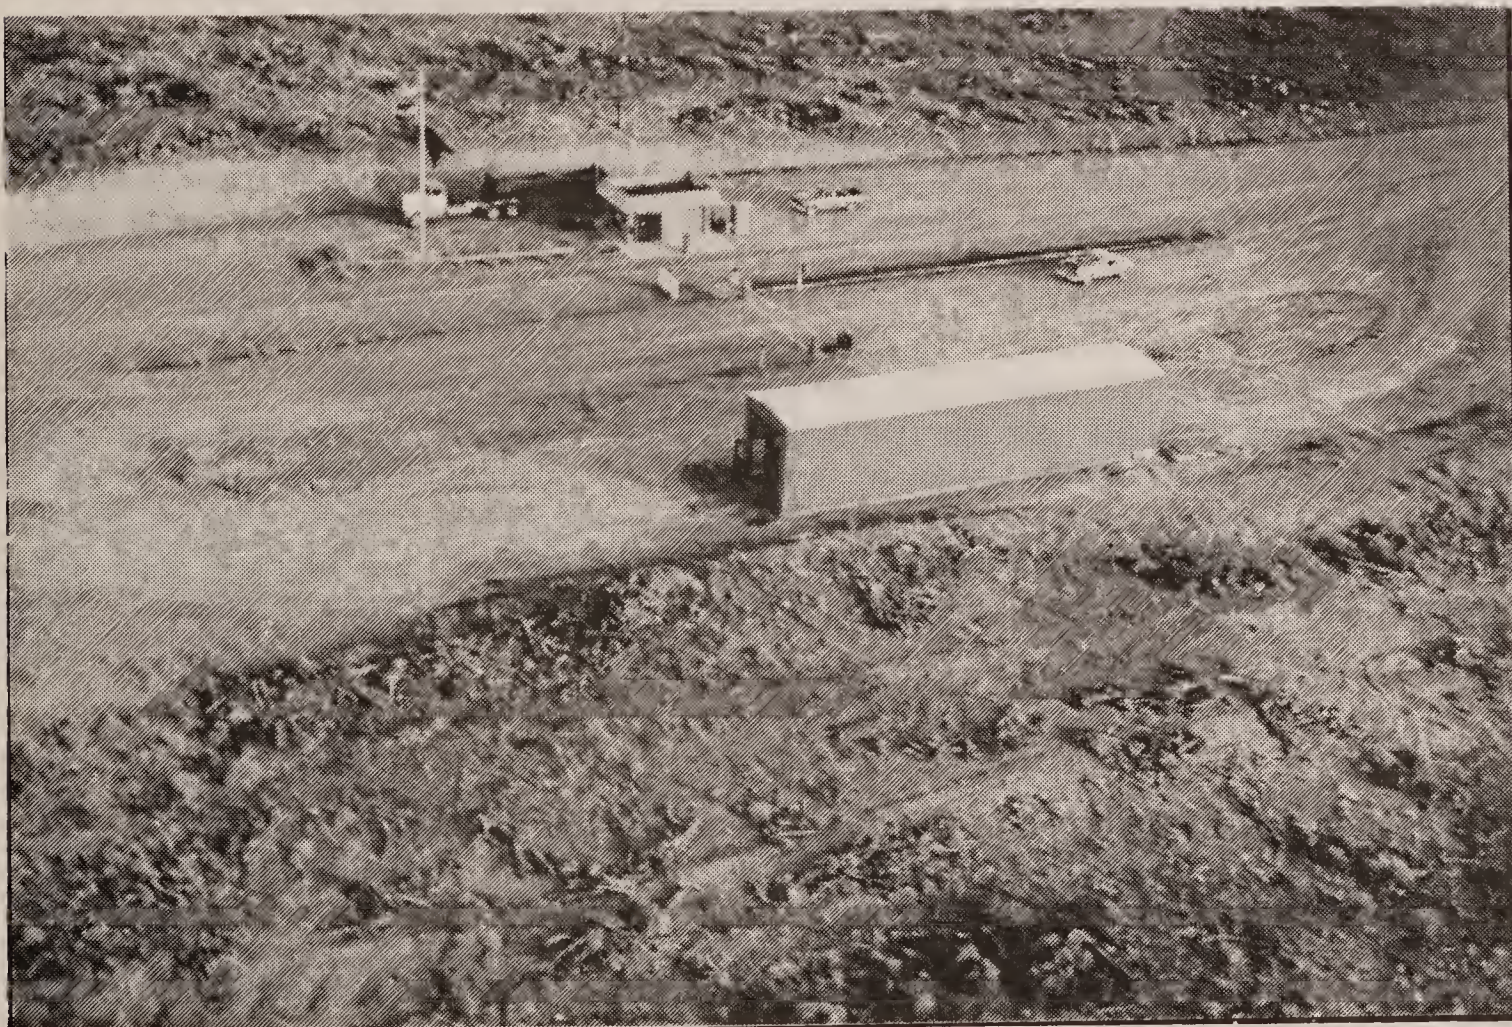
Aerial View of Truck Weighing - Scale Building and Guard Gate
